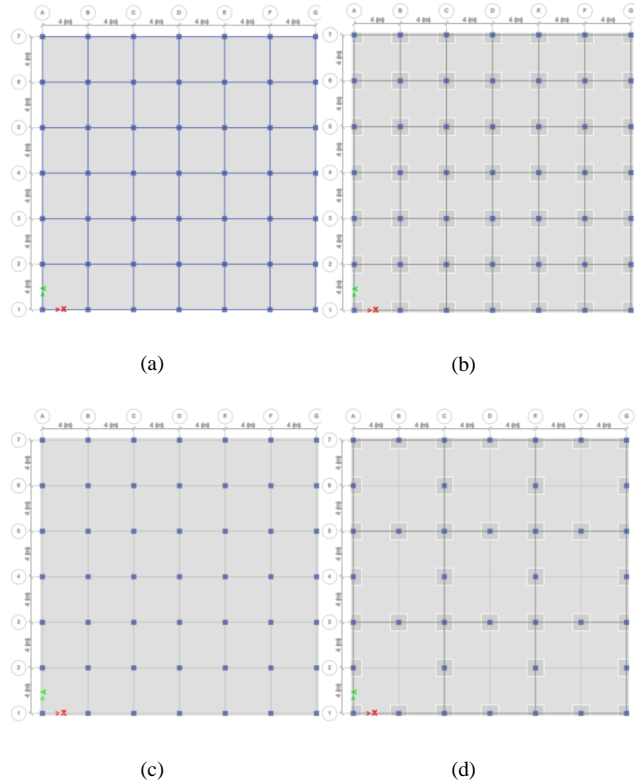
Plan of building with (a) conventional slab, (b) flat slab with drops (c) flat plate and (d) waffle slab
